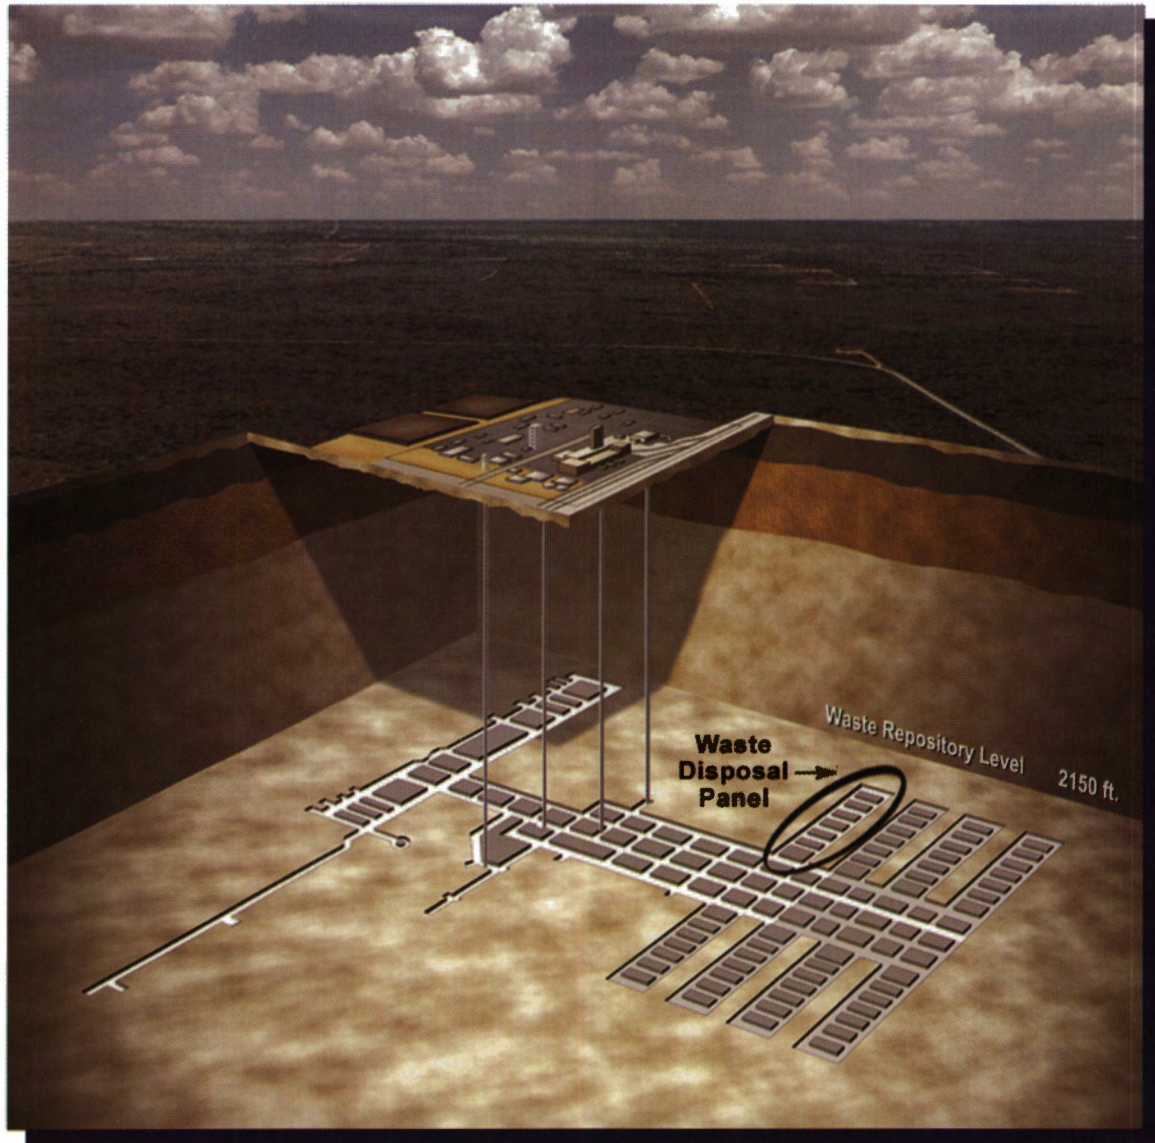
Isometric View of the WIPP Underground
